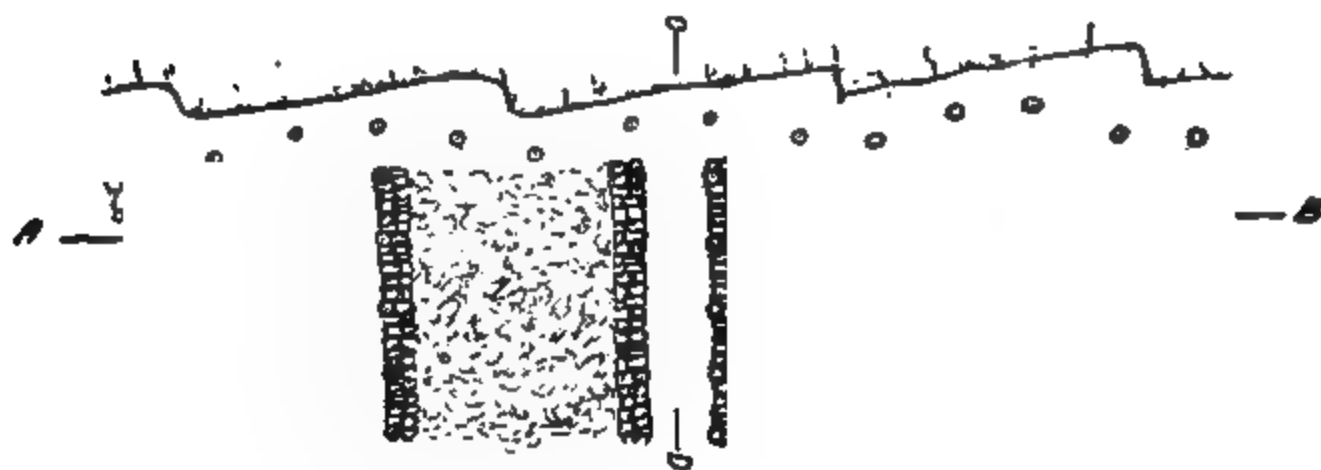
PLAN OF LONGWALL WORKINGS. (Scale 30 Feet to an Inch.)
